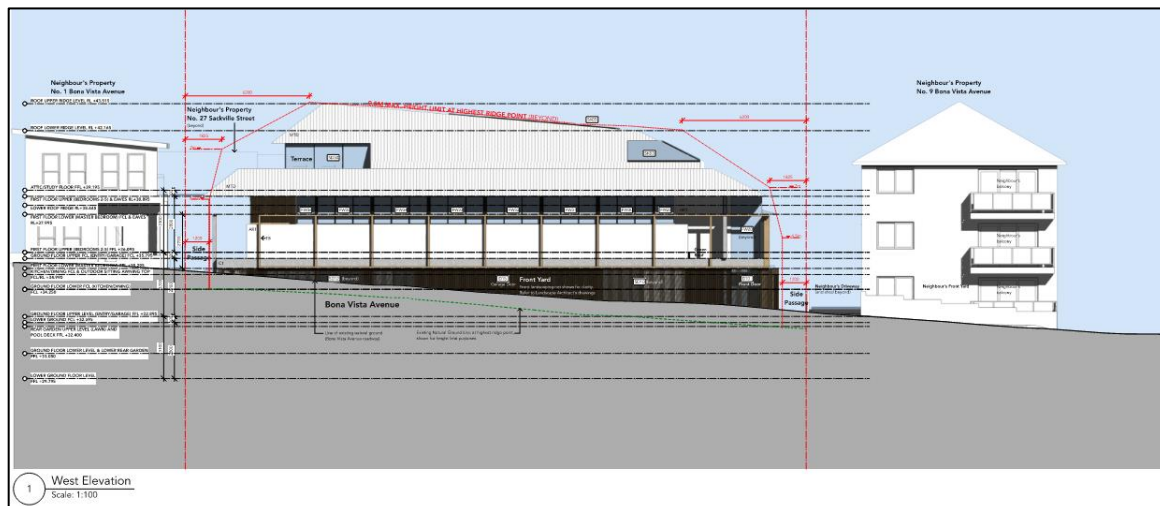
Original Proposal at Subject Site – West Elevation (appearance from the street) (Source: Dominic Levene)
